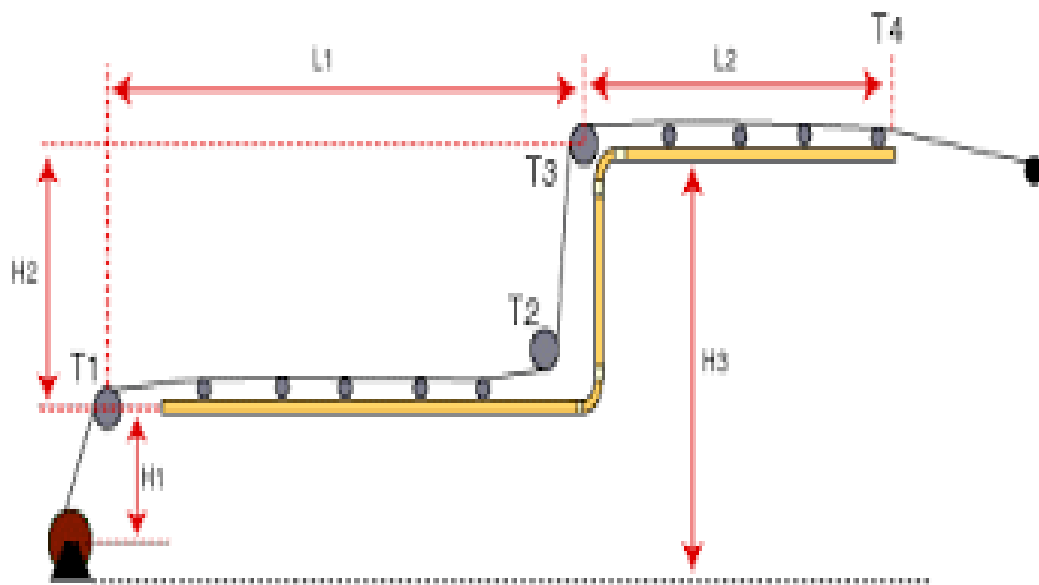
(Sample Pic) Reel Roller Setup for Cable Pulling
